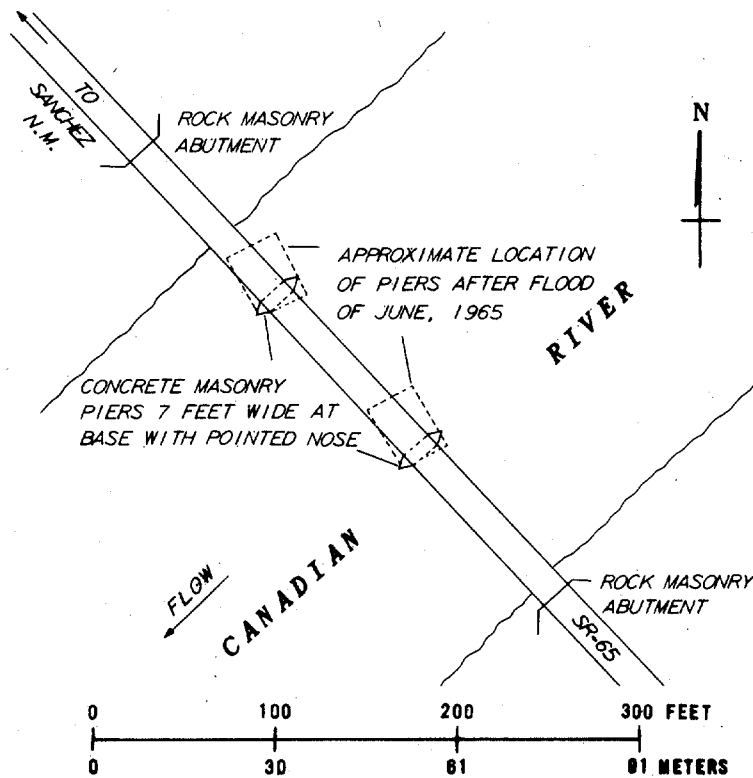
Canadian River at SR-65 near Sanchez, New Mexico, prior to 1965.
